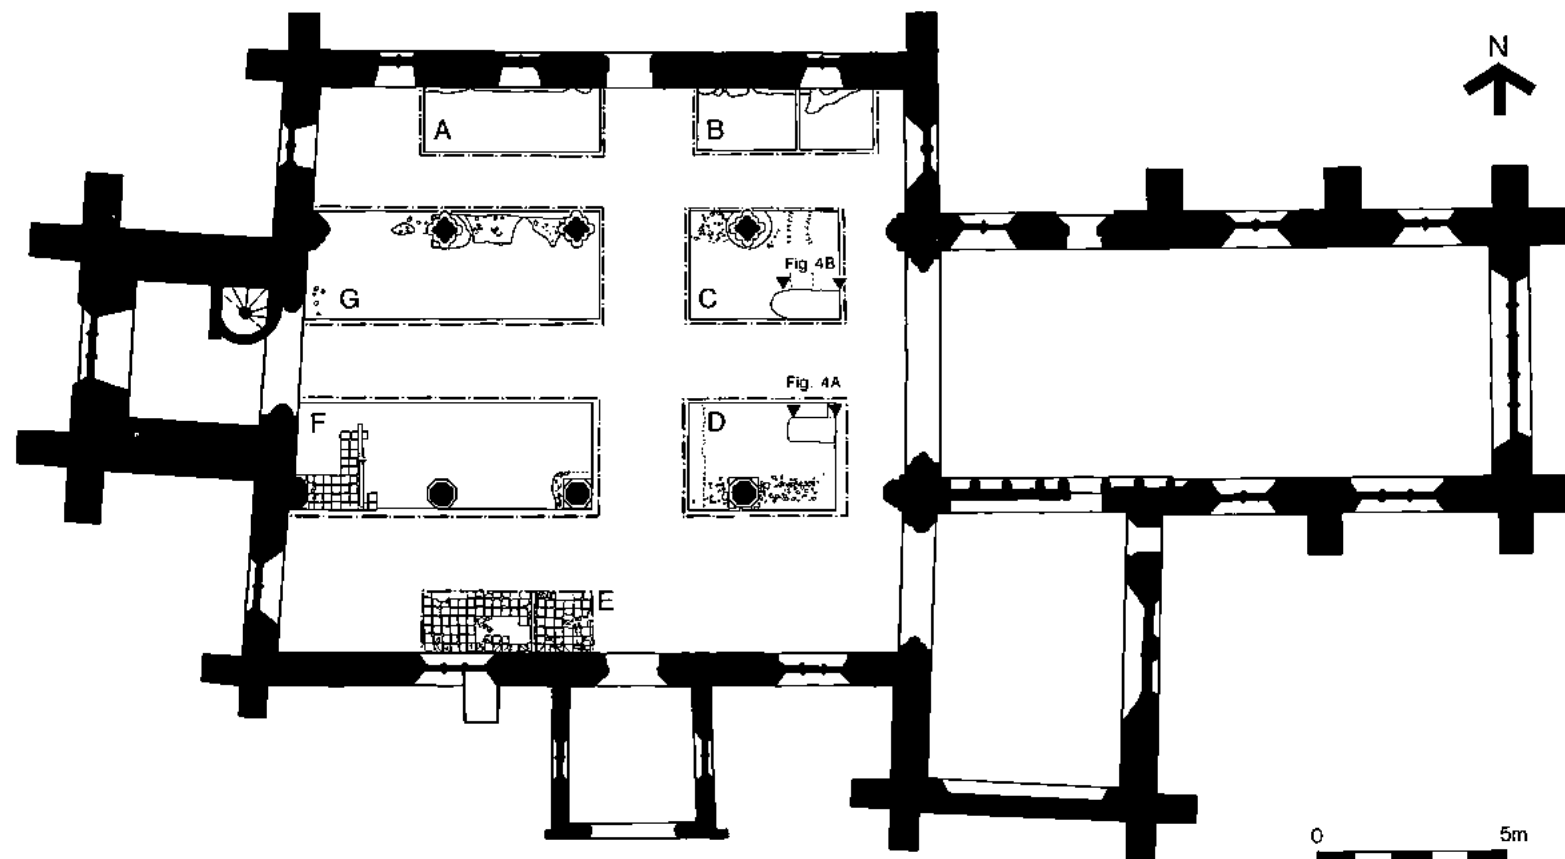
St. Michael's, Great Sampford: plan of church showing 1992 excavations. Standing masonry in solid black.
